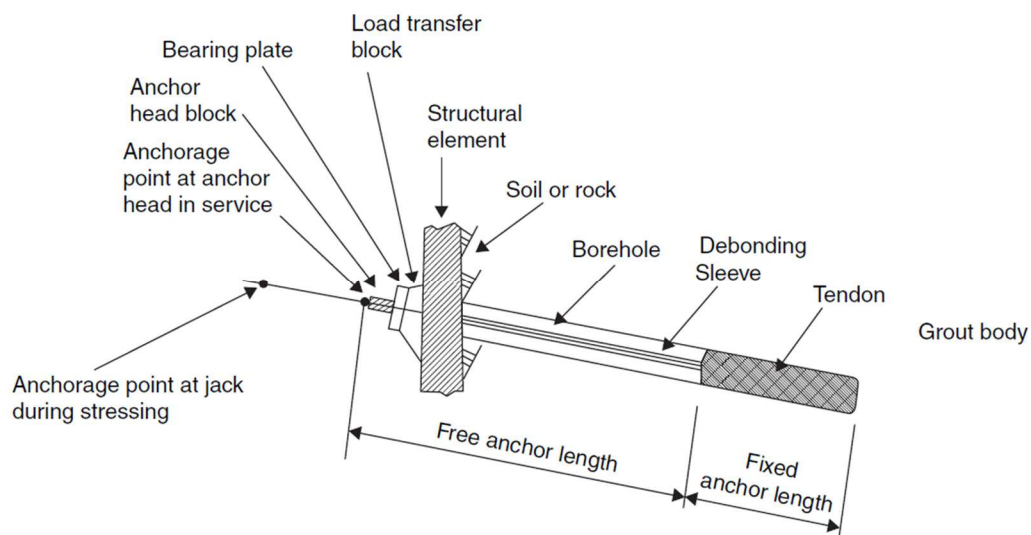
Typical ground anchor detail (reproduced from CIRIA C580)
